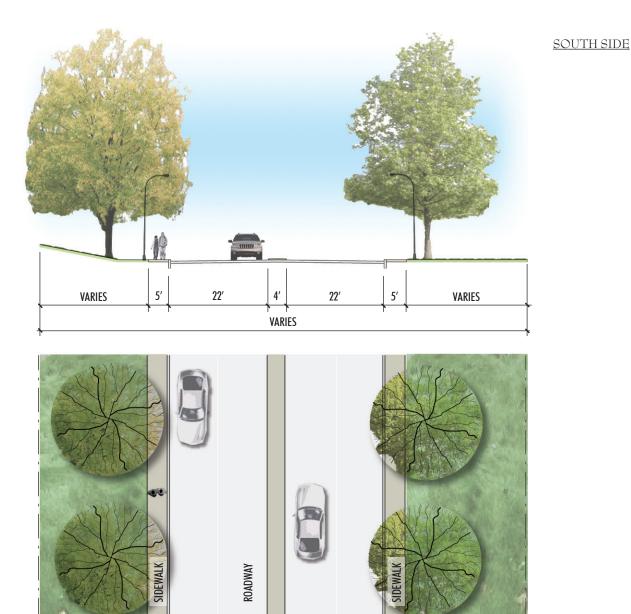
The Hub: Zone 10 Existing Conditions Section and Plan
